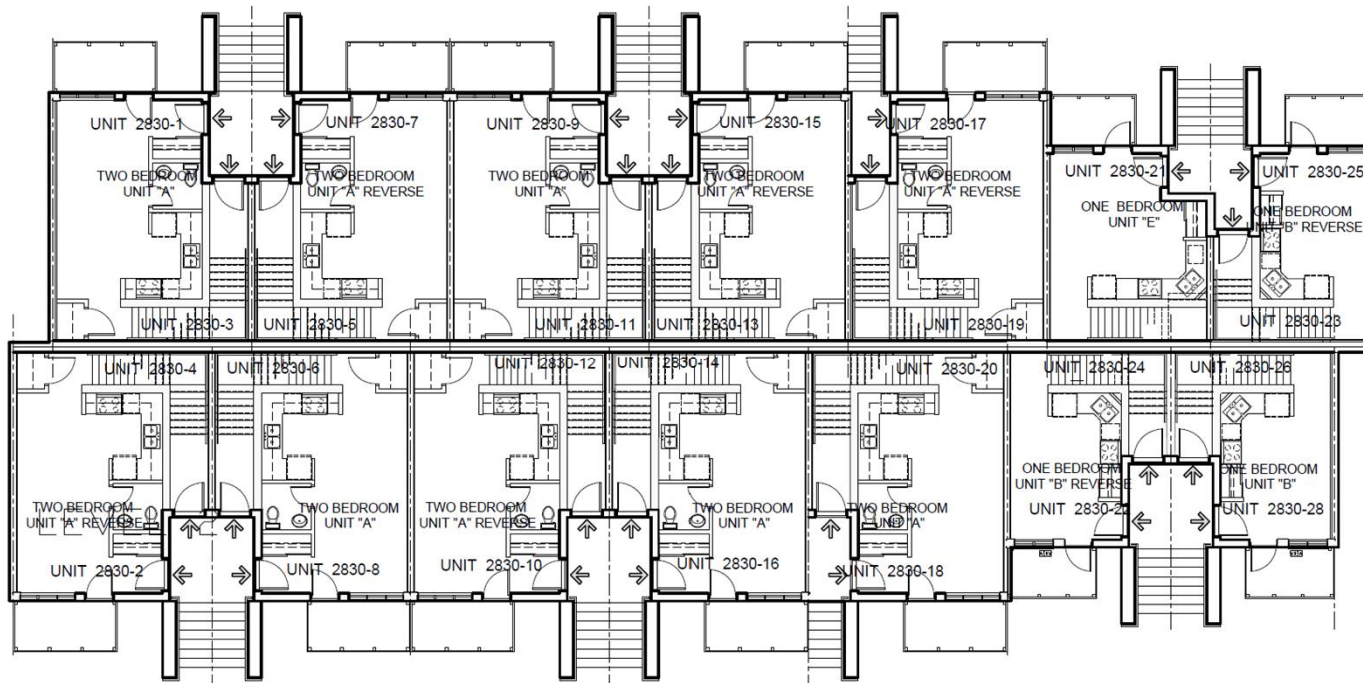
STACKED TOWNHOUSE - OVERALL FLOOR PLANS
